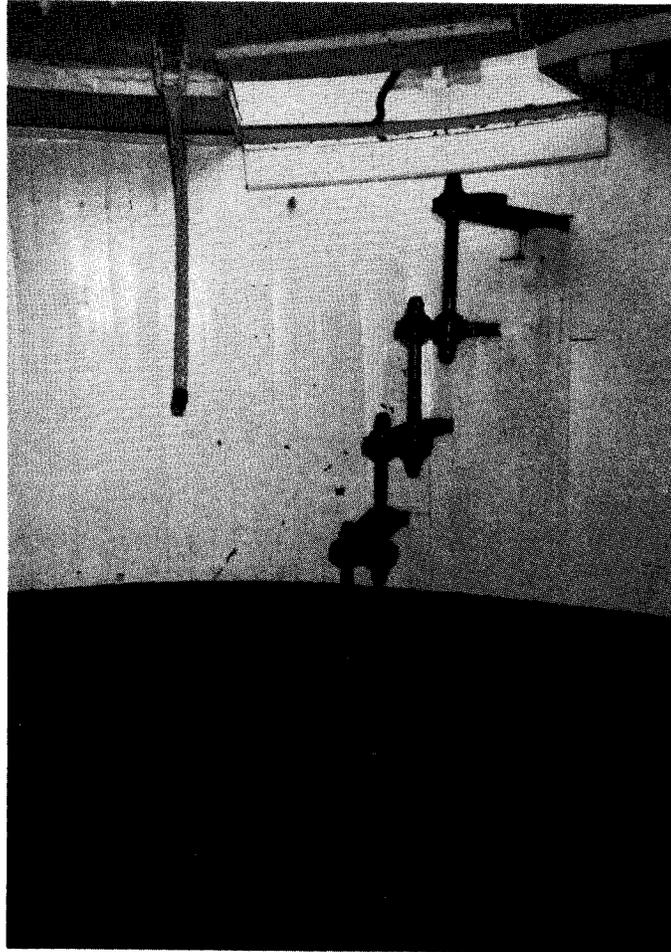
Tower, stair ascending from Watch Deck to Lantern Deck.
